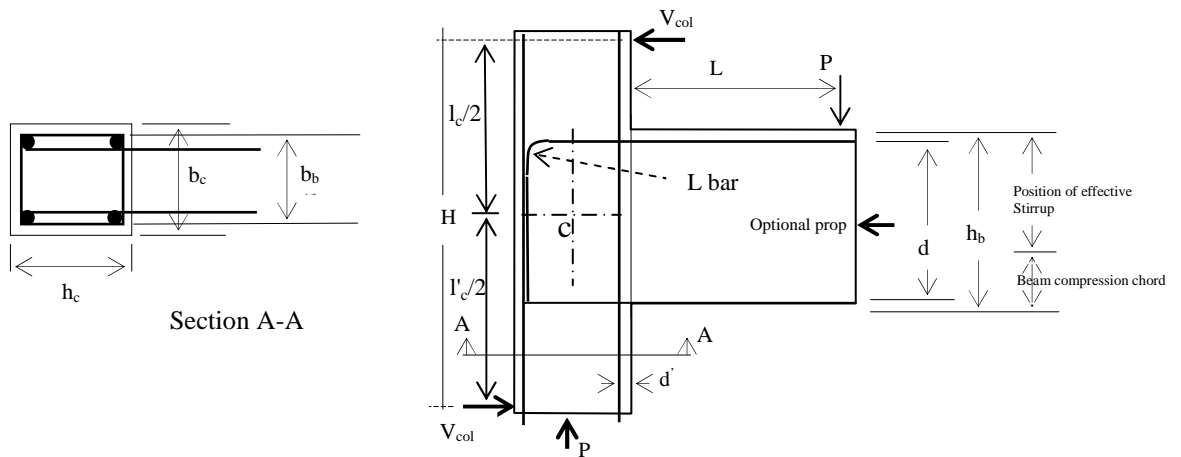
Notations used for the BCJ. L bar connections between beam and column improve joint shear by 10% to 20% [6-34] .
